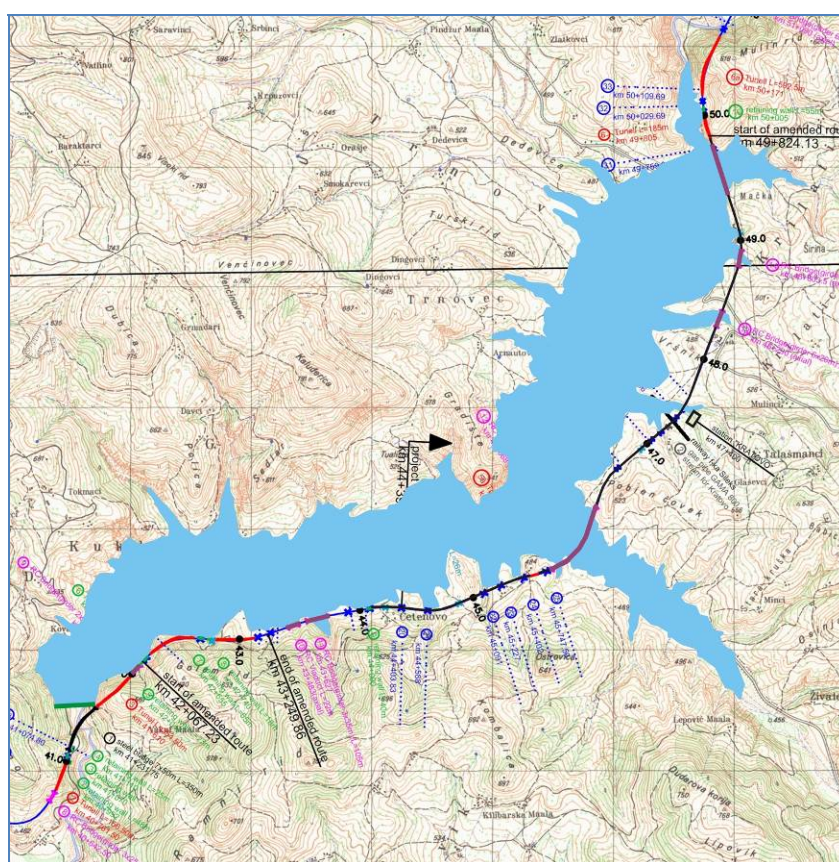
Location of planned Vakuf Dam Reservoir Location with Railway Layout (K.P. 41 to K.P. 50)
